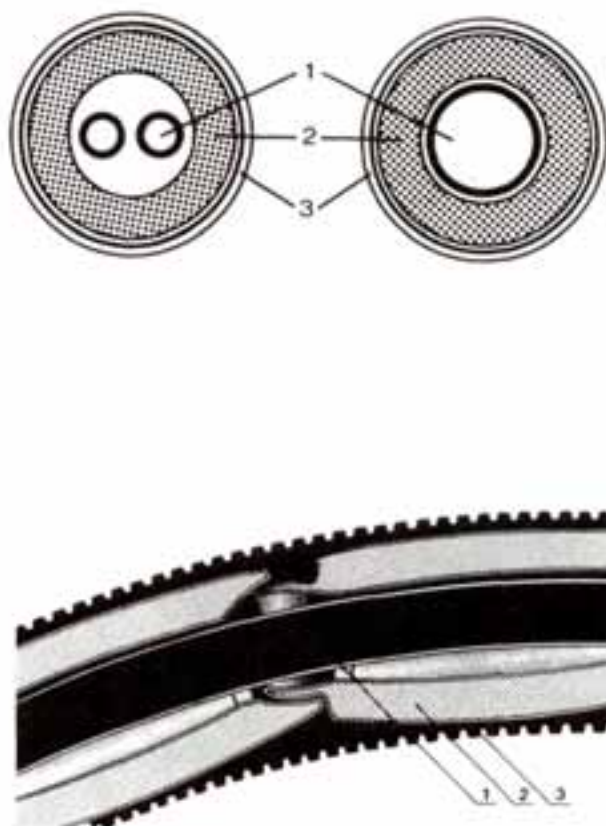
The Flexalen Pipe System with Corrugated Jacket Pipe
